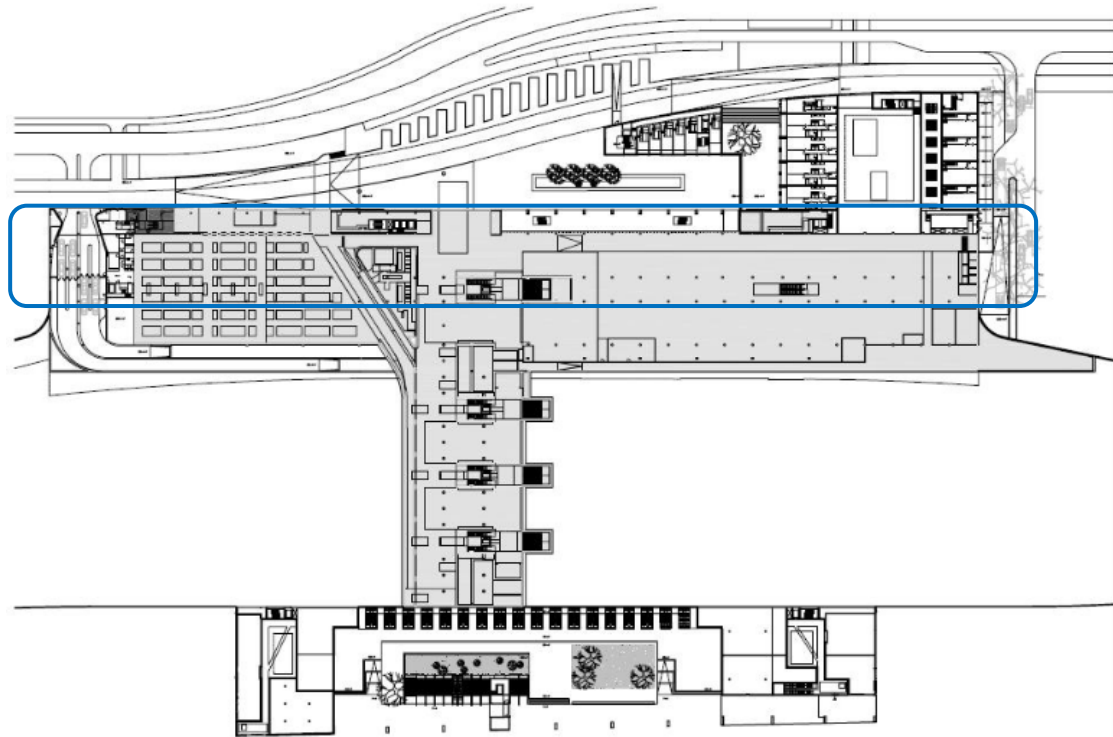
Plan view level -1, 0 (□ commercial area)
